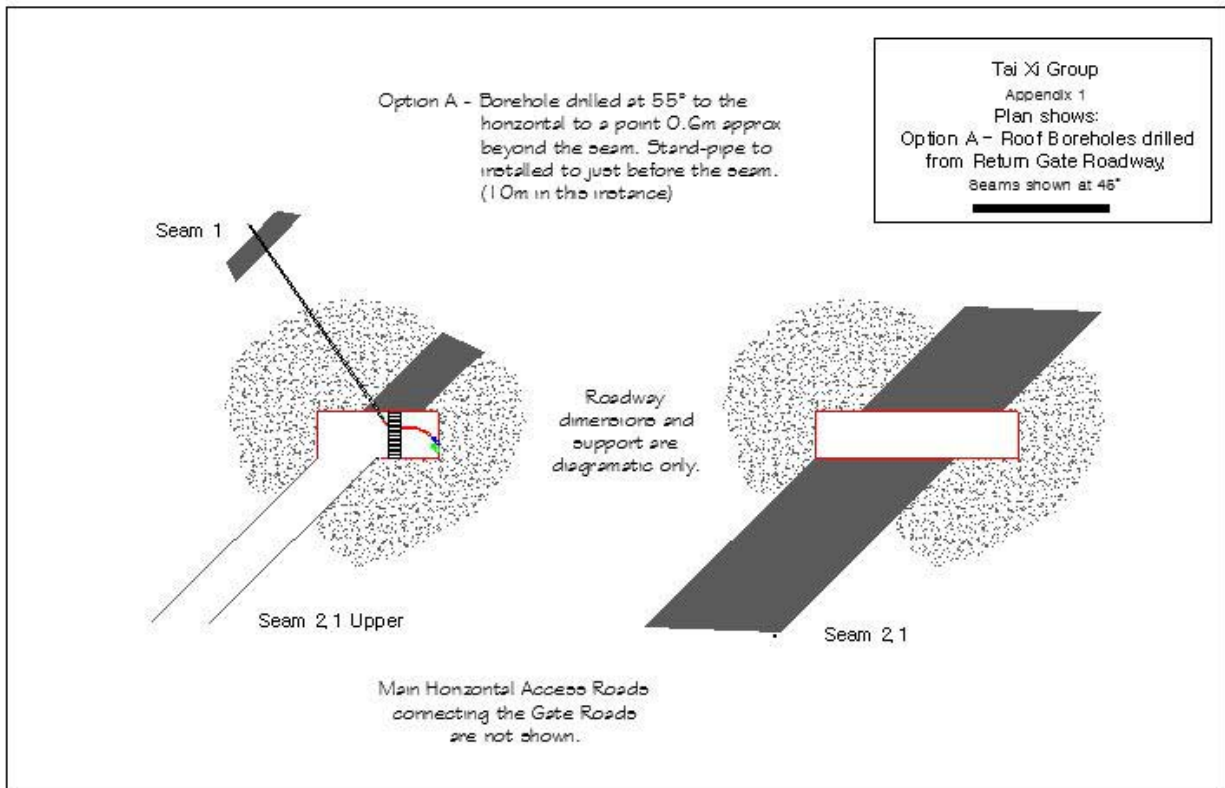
Drawing Showing Roofhole Design Drilled from Return Gate Road
